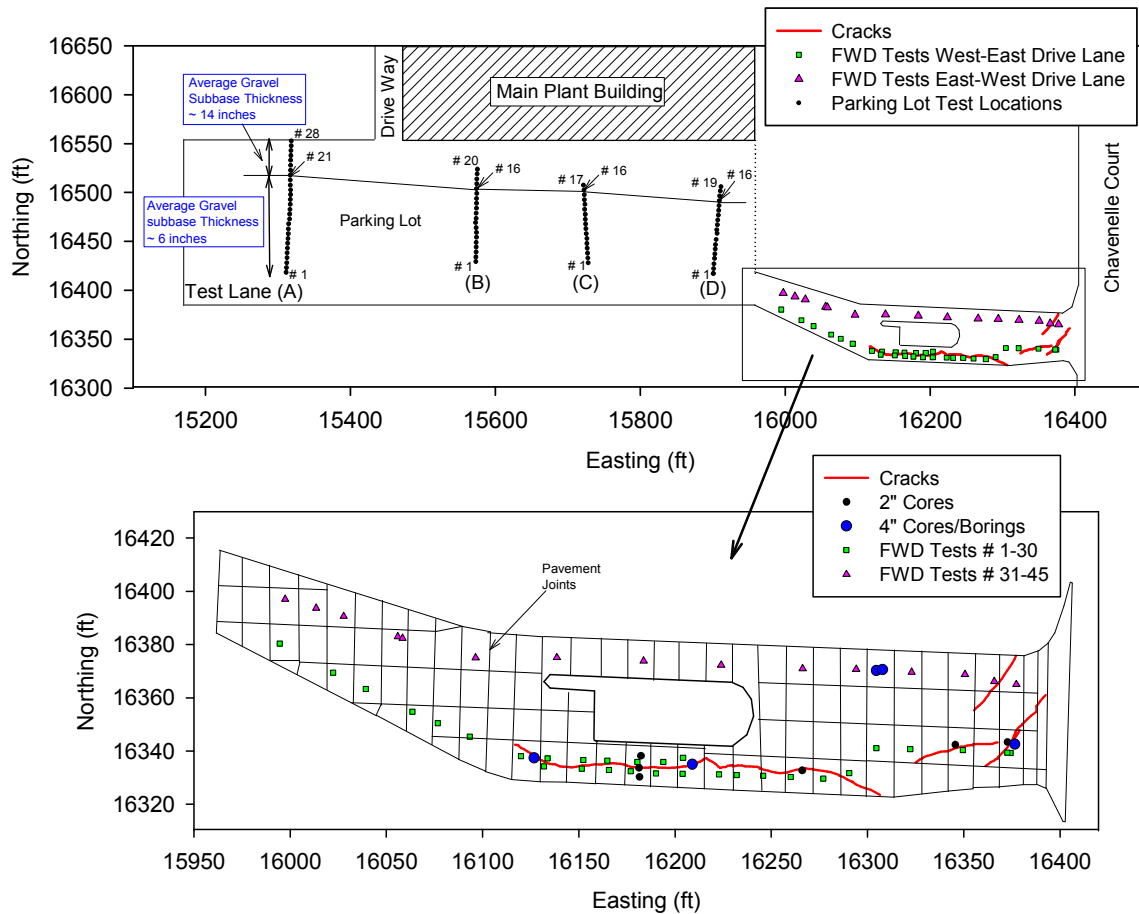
Plan view of in situ test locations, results of crack survey using GPS and cracks on the paved drive way (from White et al. 2009)
